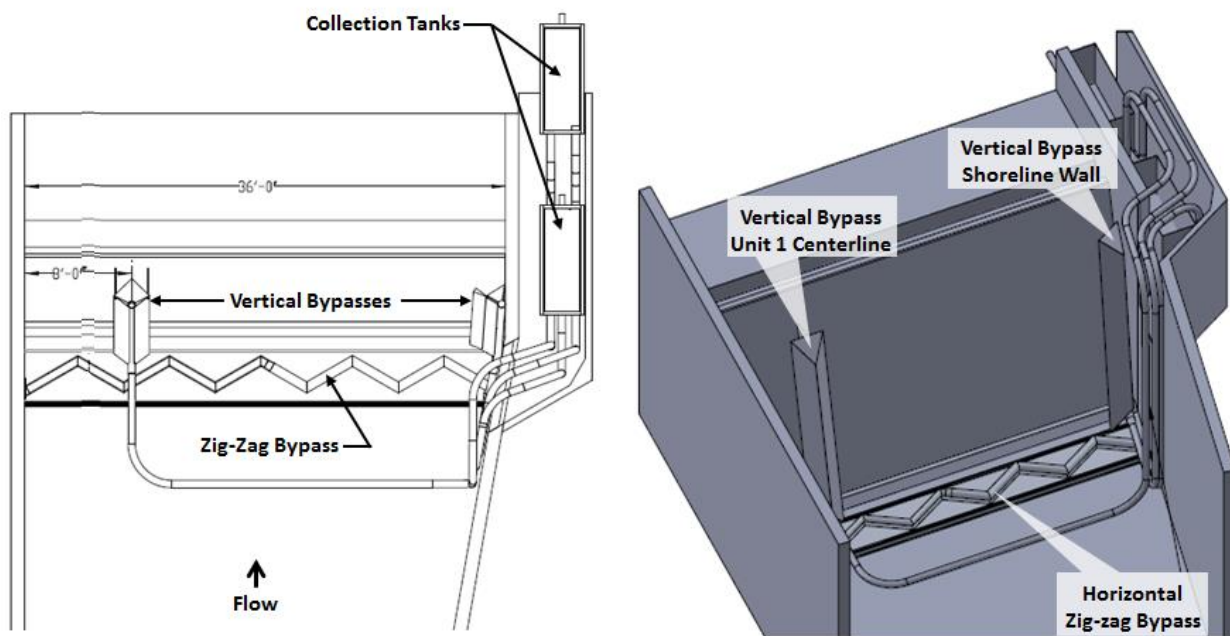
Design and location of vertical and horizontal bypasses installed at the Mine Falls Project.
